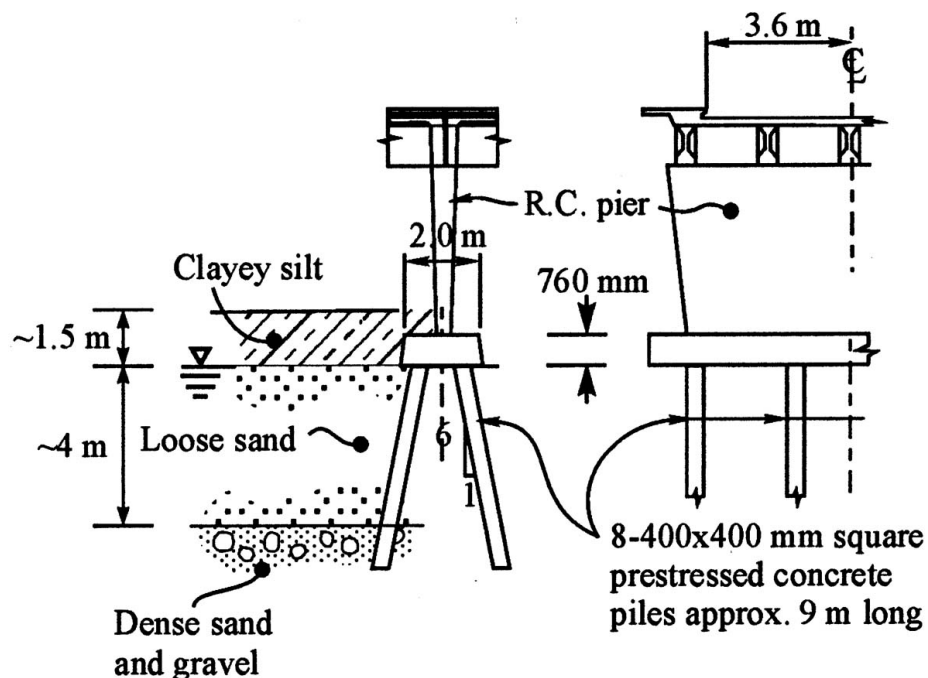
Typical pier foundation at Landing Road Bridge, 1987 Edgecumbe earthquake (Yasuda and Berrill 2000).
